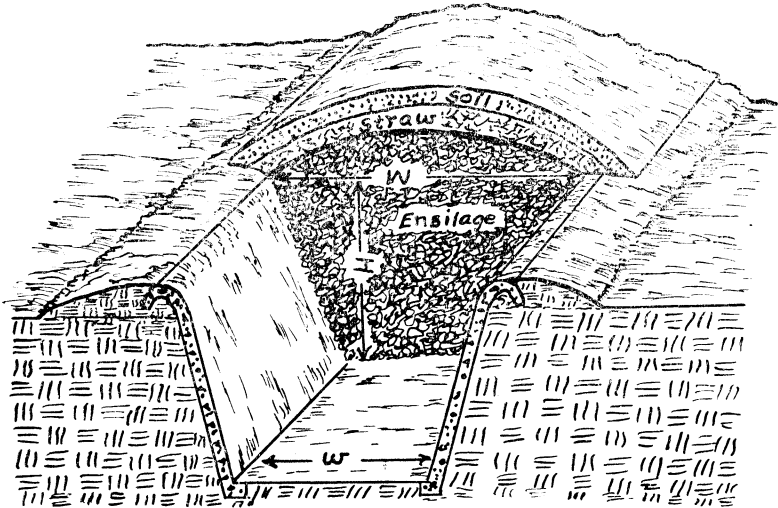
Cross-section of a trench silo, showing the concrete lining, foundation and method of covering the ensilage.
